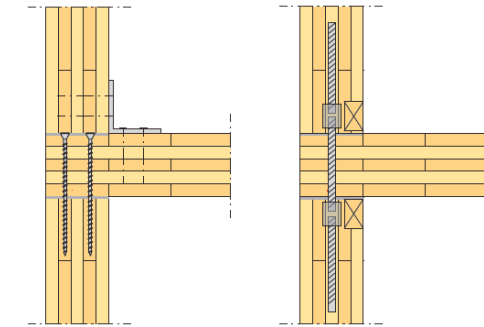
Joint between wall panel and floor slab using angle bracket.
